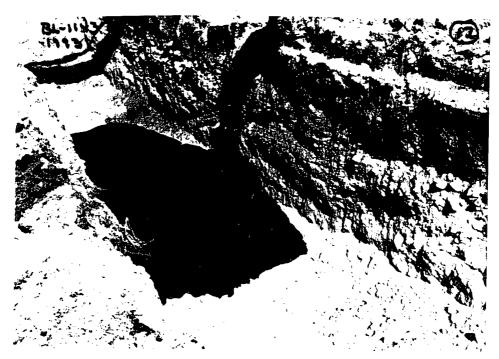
#6 PIT PRIOR TO BACKHOE NOTCHING #5 PIT.
